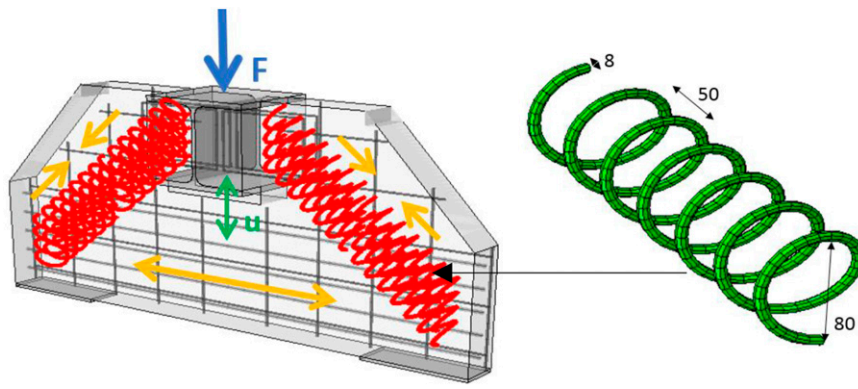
Expected resisting mechanism for the slab with additional steel spirals, and detail view of the circular spirals (dimensions in mm).
